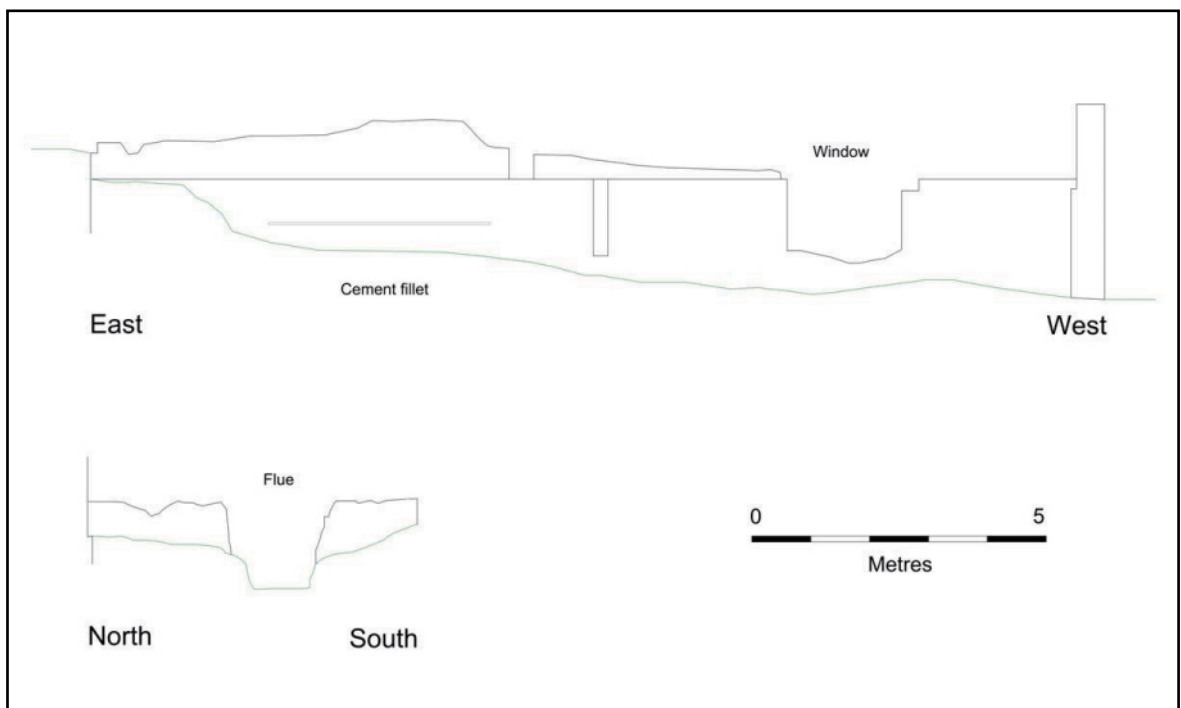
Wheal Coates boiler house [190377] internal elevations.
